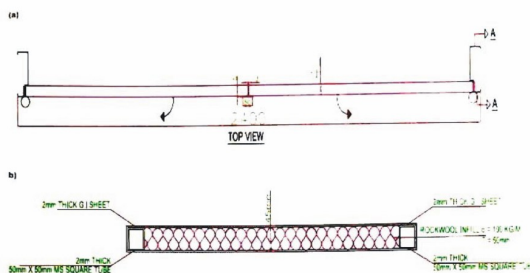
(a) Top view showing meeting stile section fixing details of assembled steel double door set, (b) Top view of section showing details of leaf of steel double door set
